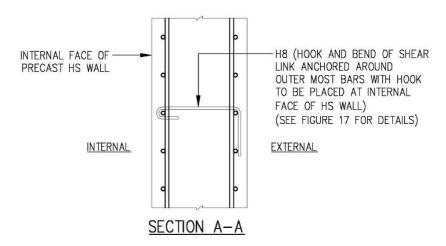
(b) REINFORCEMENT BAR DETAILS OF WALL, RIB AND HS DOOR ON SHORT WALL OF PRECAST HS
